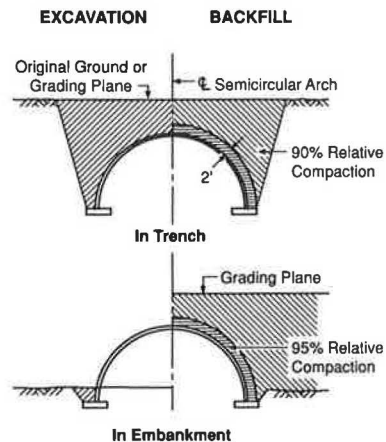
Bedding and backfill: semicircular reinforced concrete arch.
